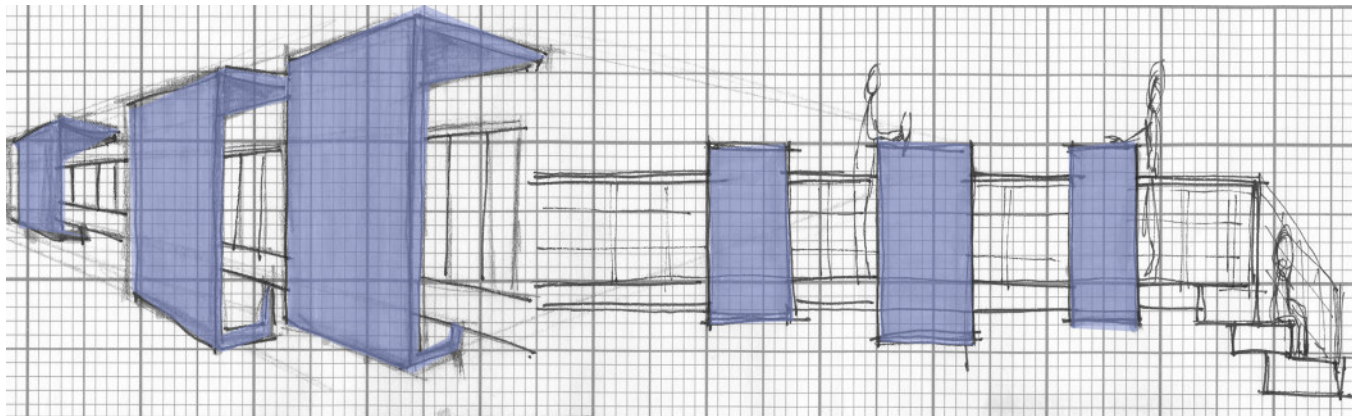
Drawings of the Plexiglas tables on the mezzanine level
